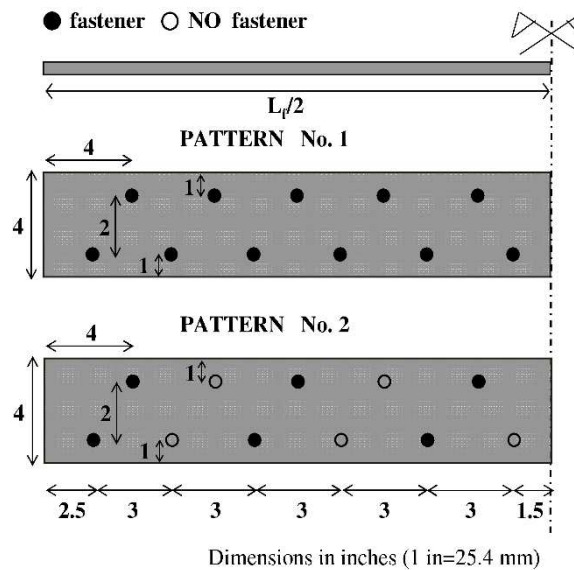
Adopted MF-FRP fasteners layout for the beams tested by Napoli [67]
